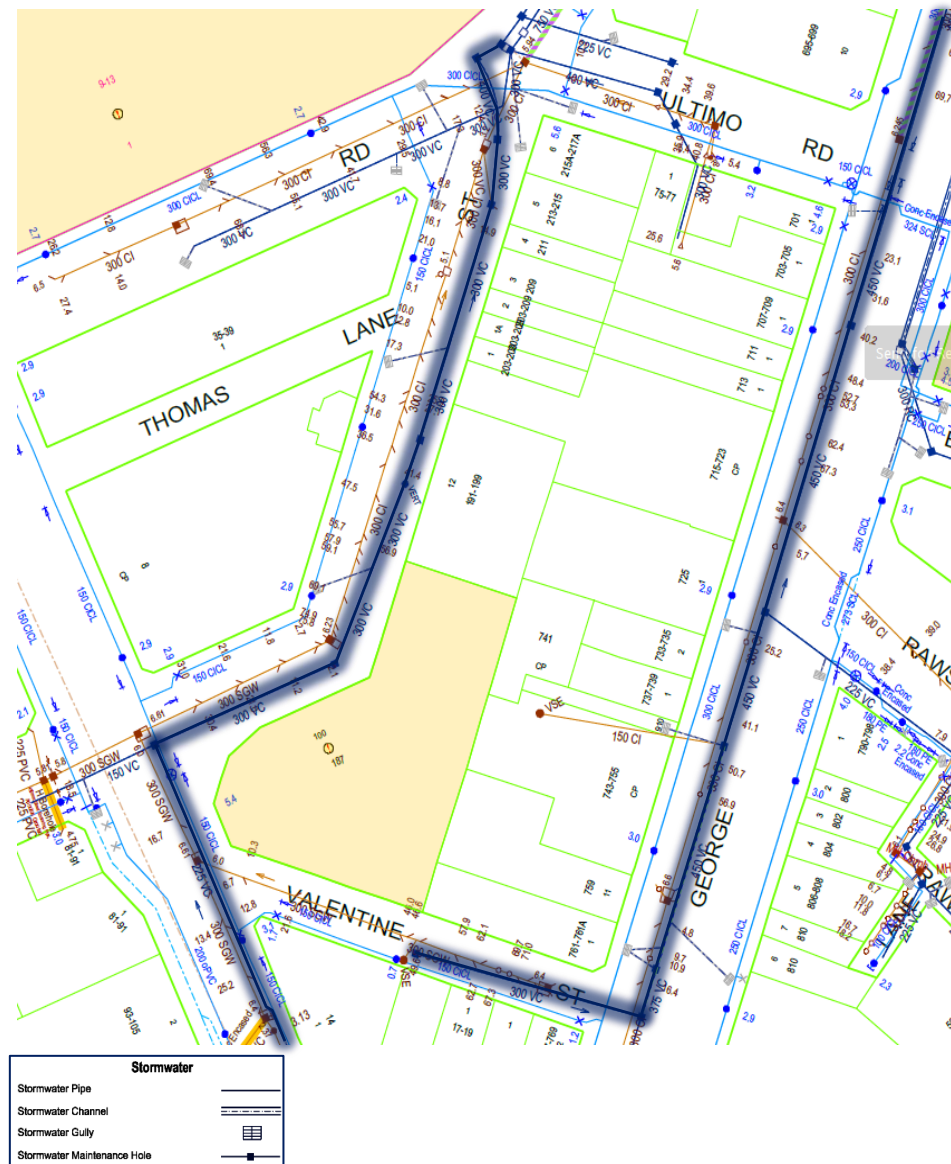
Existing stormwater infrastructure surrounding 187 Thomas Street (*source: Sydney Water*)
